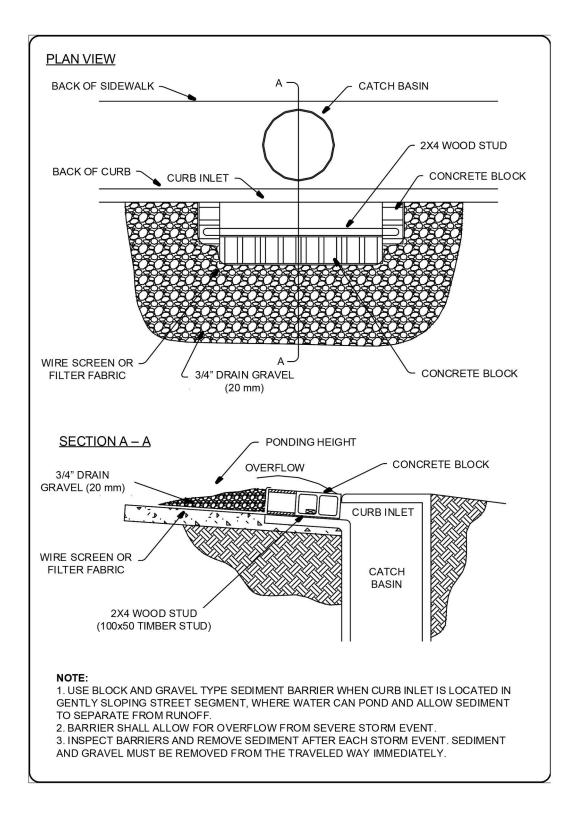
20: Block and Gravel Curb Inlet Protection
